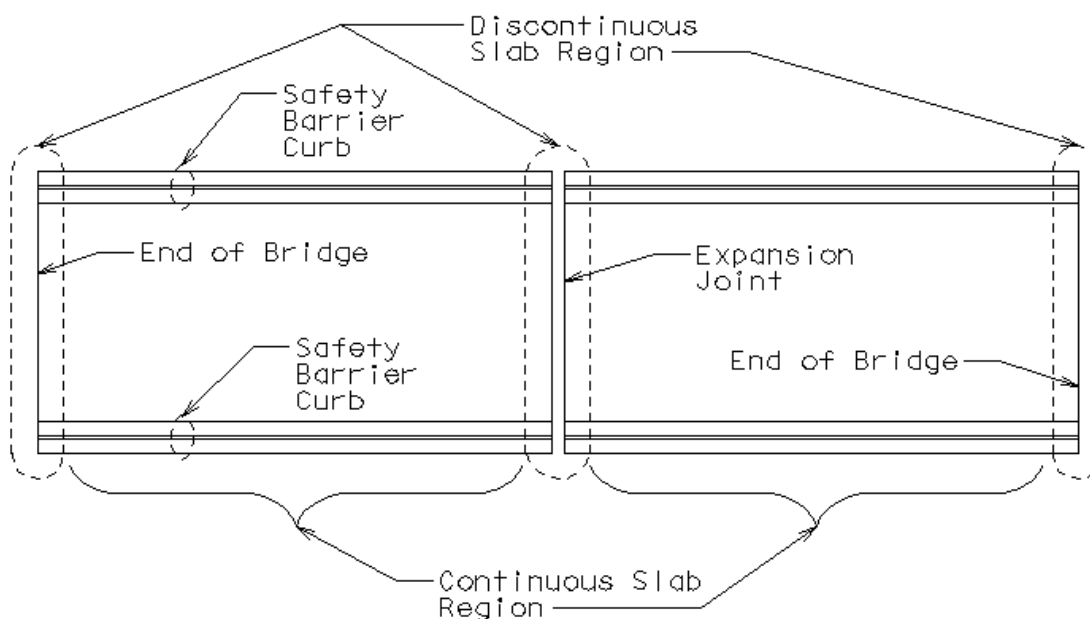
Plan View of Bridge Showing Continuous and Discontinuous Slab Regions
